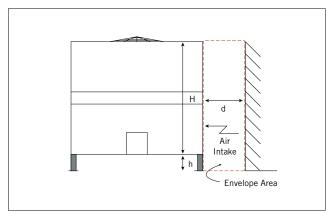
Elevation View of a Dual Air Intake Unit Adjacent to Wall
